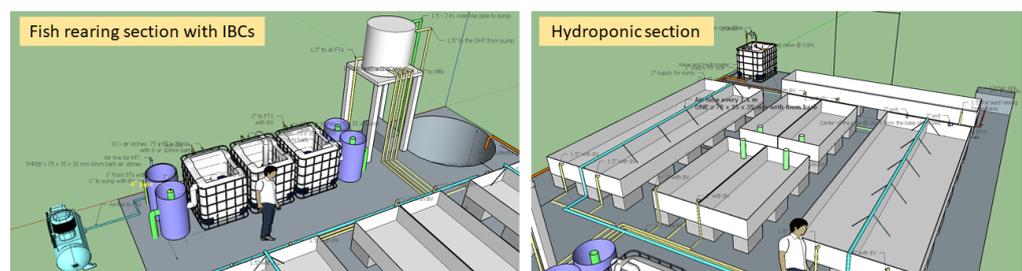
A screenshot of the farm plan and plumbing details prepared before starting the construction.
